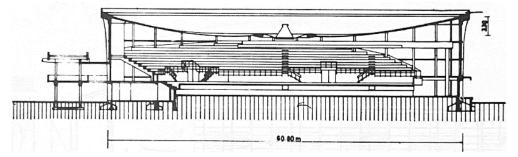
The section of the Hall with showcased span and height of the inverted dome ([5], 3)
